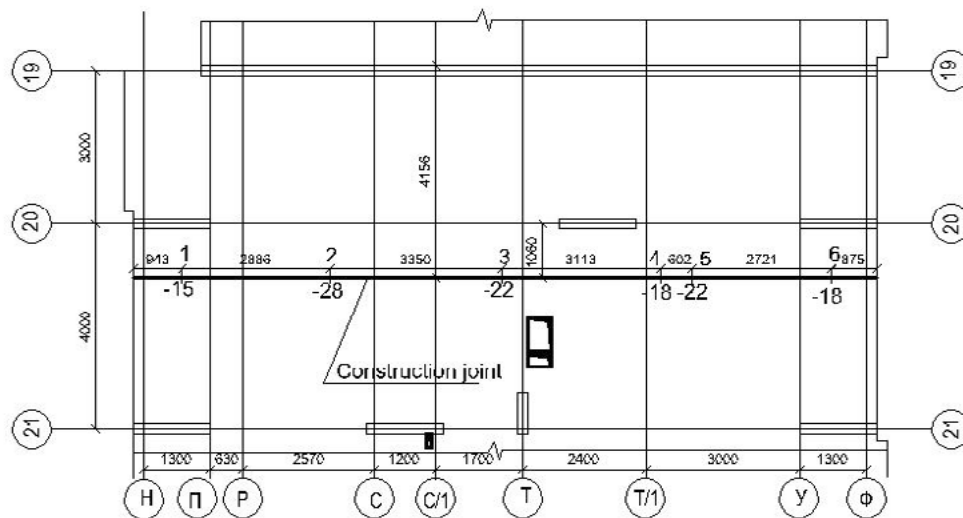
Scheme for the definition of deflections of concrete in the places of the construction joint (10 floor).
